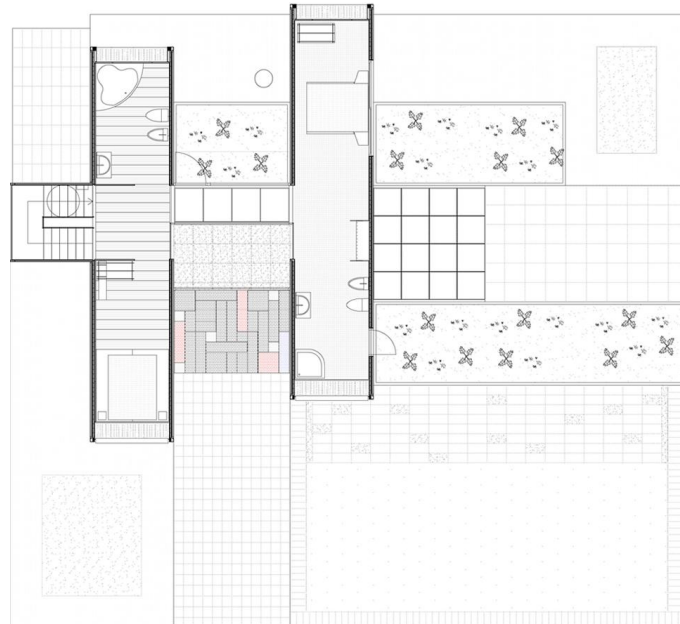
R4House has been built using Six Modules, and all its Components are Removable, Including Foundations, Installations and Equipment
